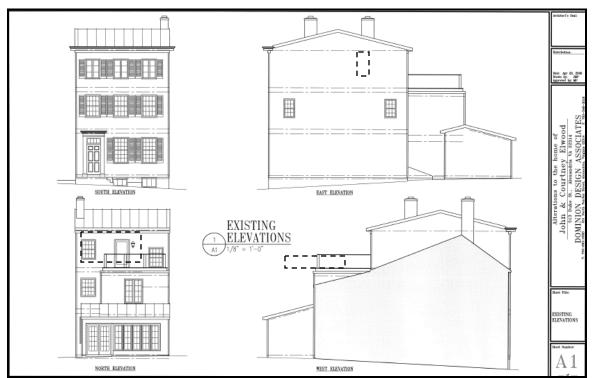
Existing elevations with dashed lines showing areas of demolition/encapsulation.
